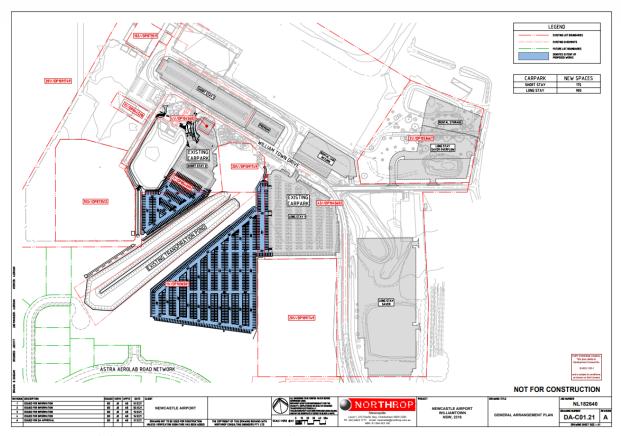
Approved Plan DA 16-2021-1153-1. Source: Northrop
